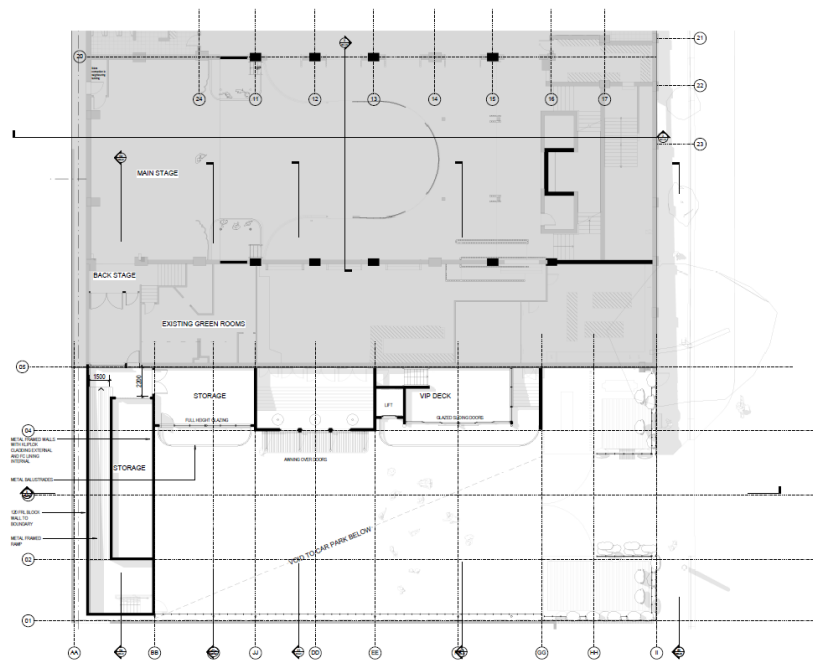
Proposed Carpark upper Floor Plan (Source: JDA Co.) – refer attached PDF for full drawing
